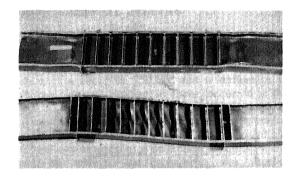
Residual deformations in coupling beams of Specimens 1 (top) and 2 (bottom) after removal from walls.
